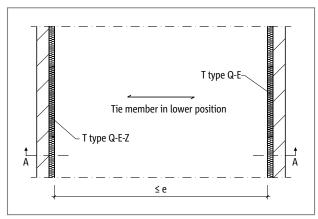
Schöck Isokorb® T type Q-E, Q-E-Z: Reinforced concrete slab tensioned in a single axis
